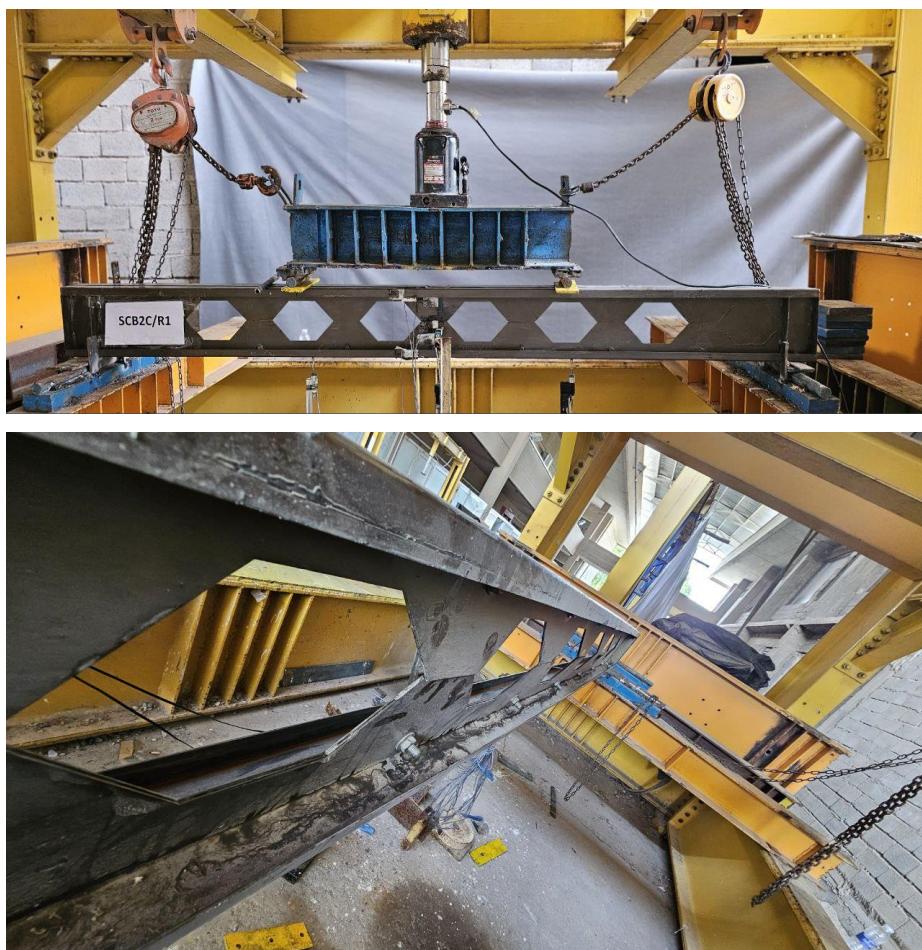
Tested specimen SCB2C/R1 and Failure mode
